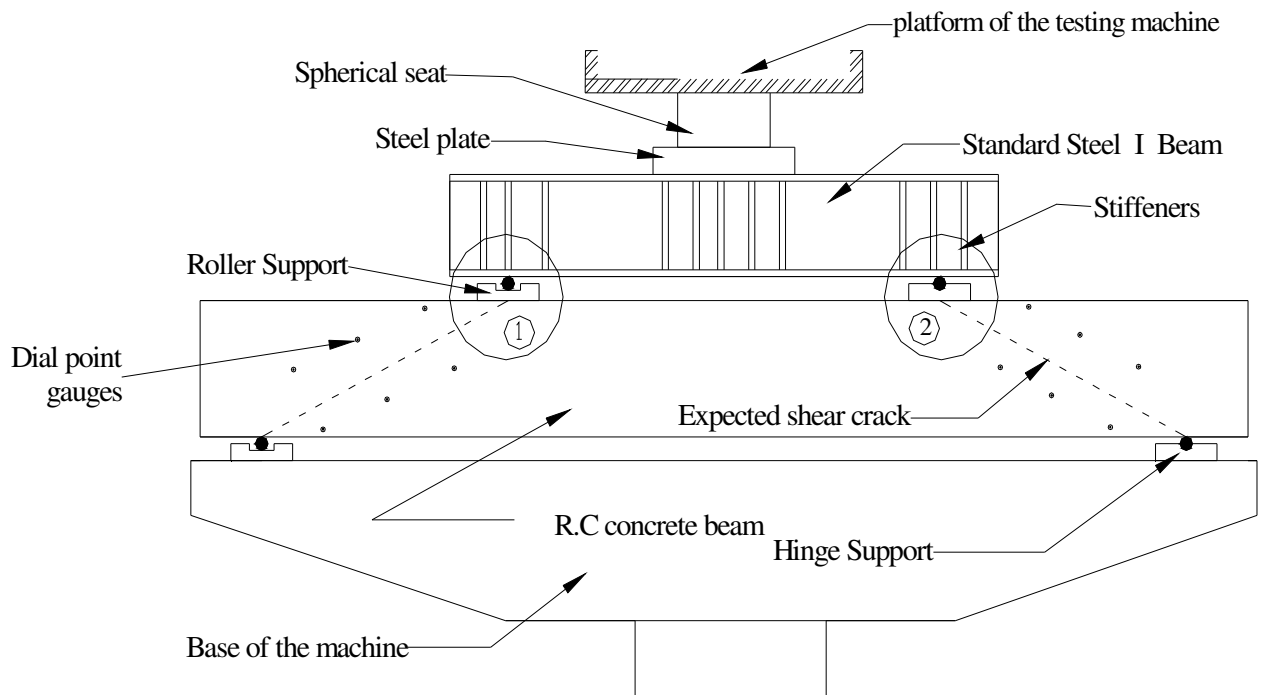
Details of the beam instrumentations, support and the testing machine.
